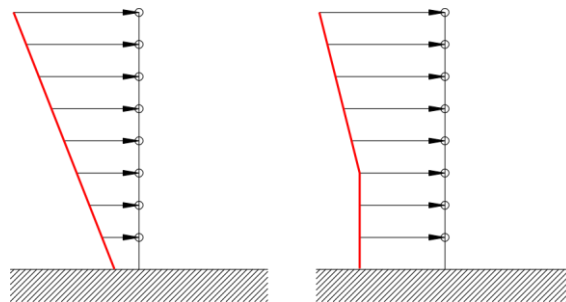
Force distribution in the lateral load resisting system (left) and on floor diaphragms (right) (Sabelli et al. 2009)
